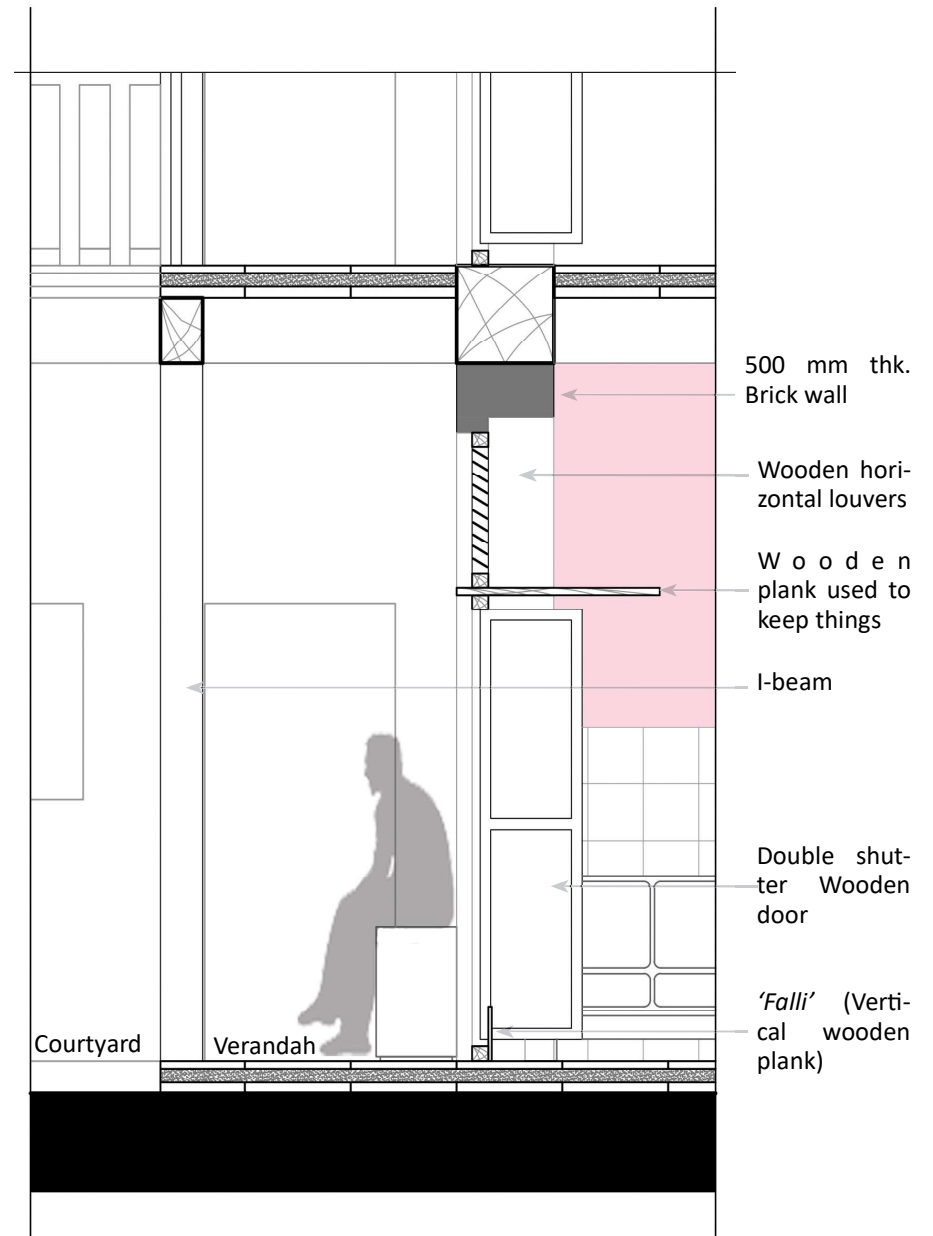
Detail Section B-B' - Door + Window + Ventilator Combo
